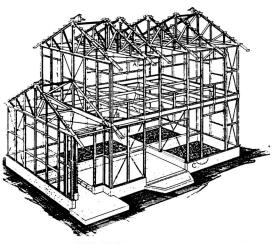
Steel Prefabricated House (Mishima, 1994)
